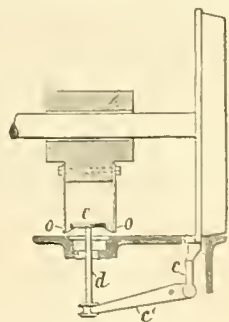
MECHANICAL SURFACE-CONTACT RAILWAY SYSTEM.
